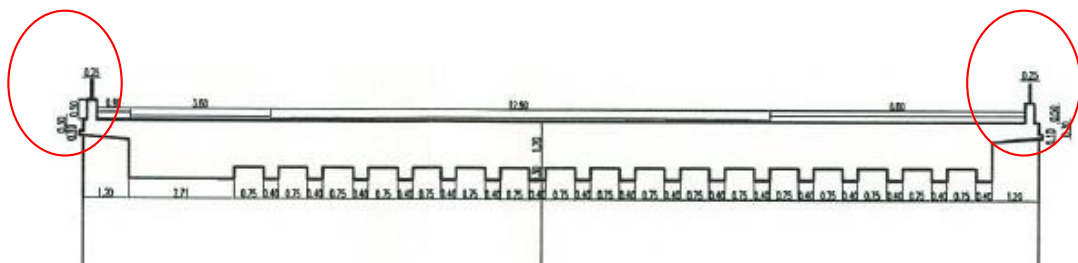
Characteristic dimensions of cantilever slabs, cross section 2-2
